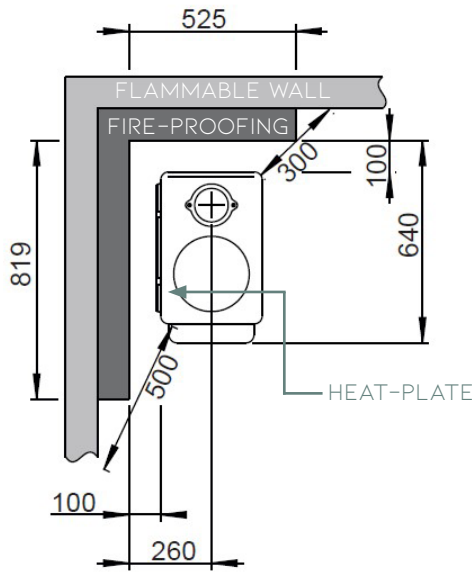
Jøtul 602 Stove Installation with Exterior Fire-proof Wall and Additional Heat-Plate (Jøtul 602 ECO Oppstillingsvilkår)
